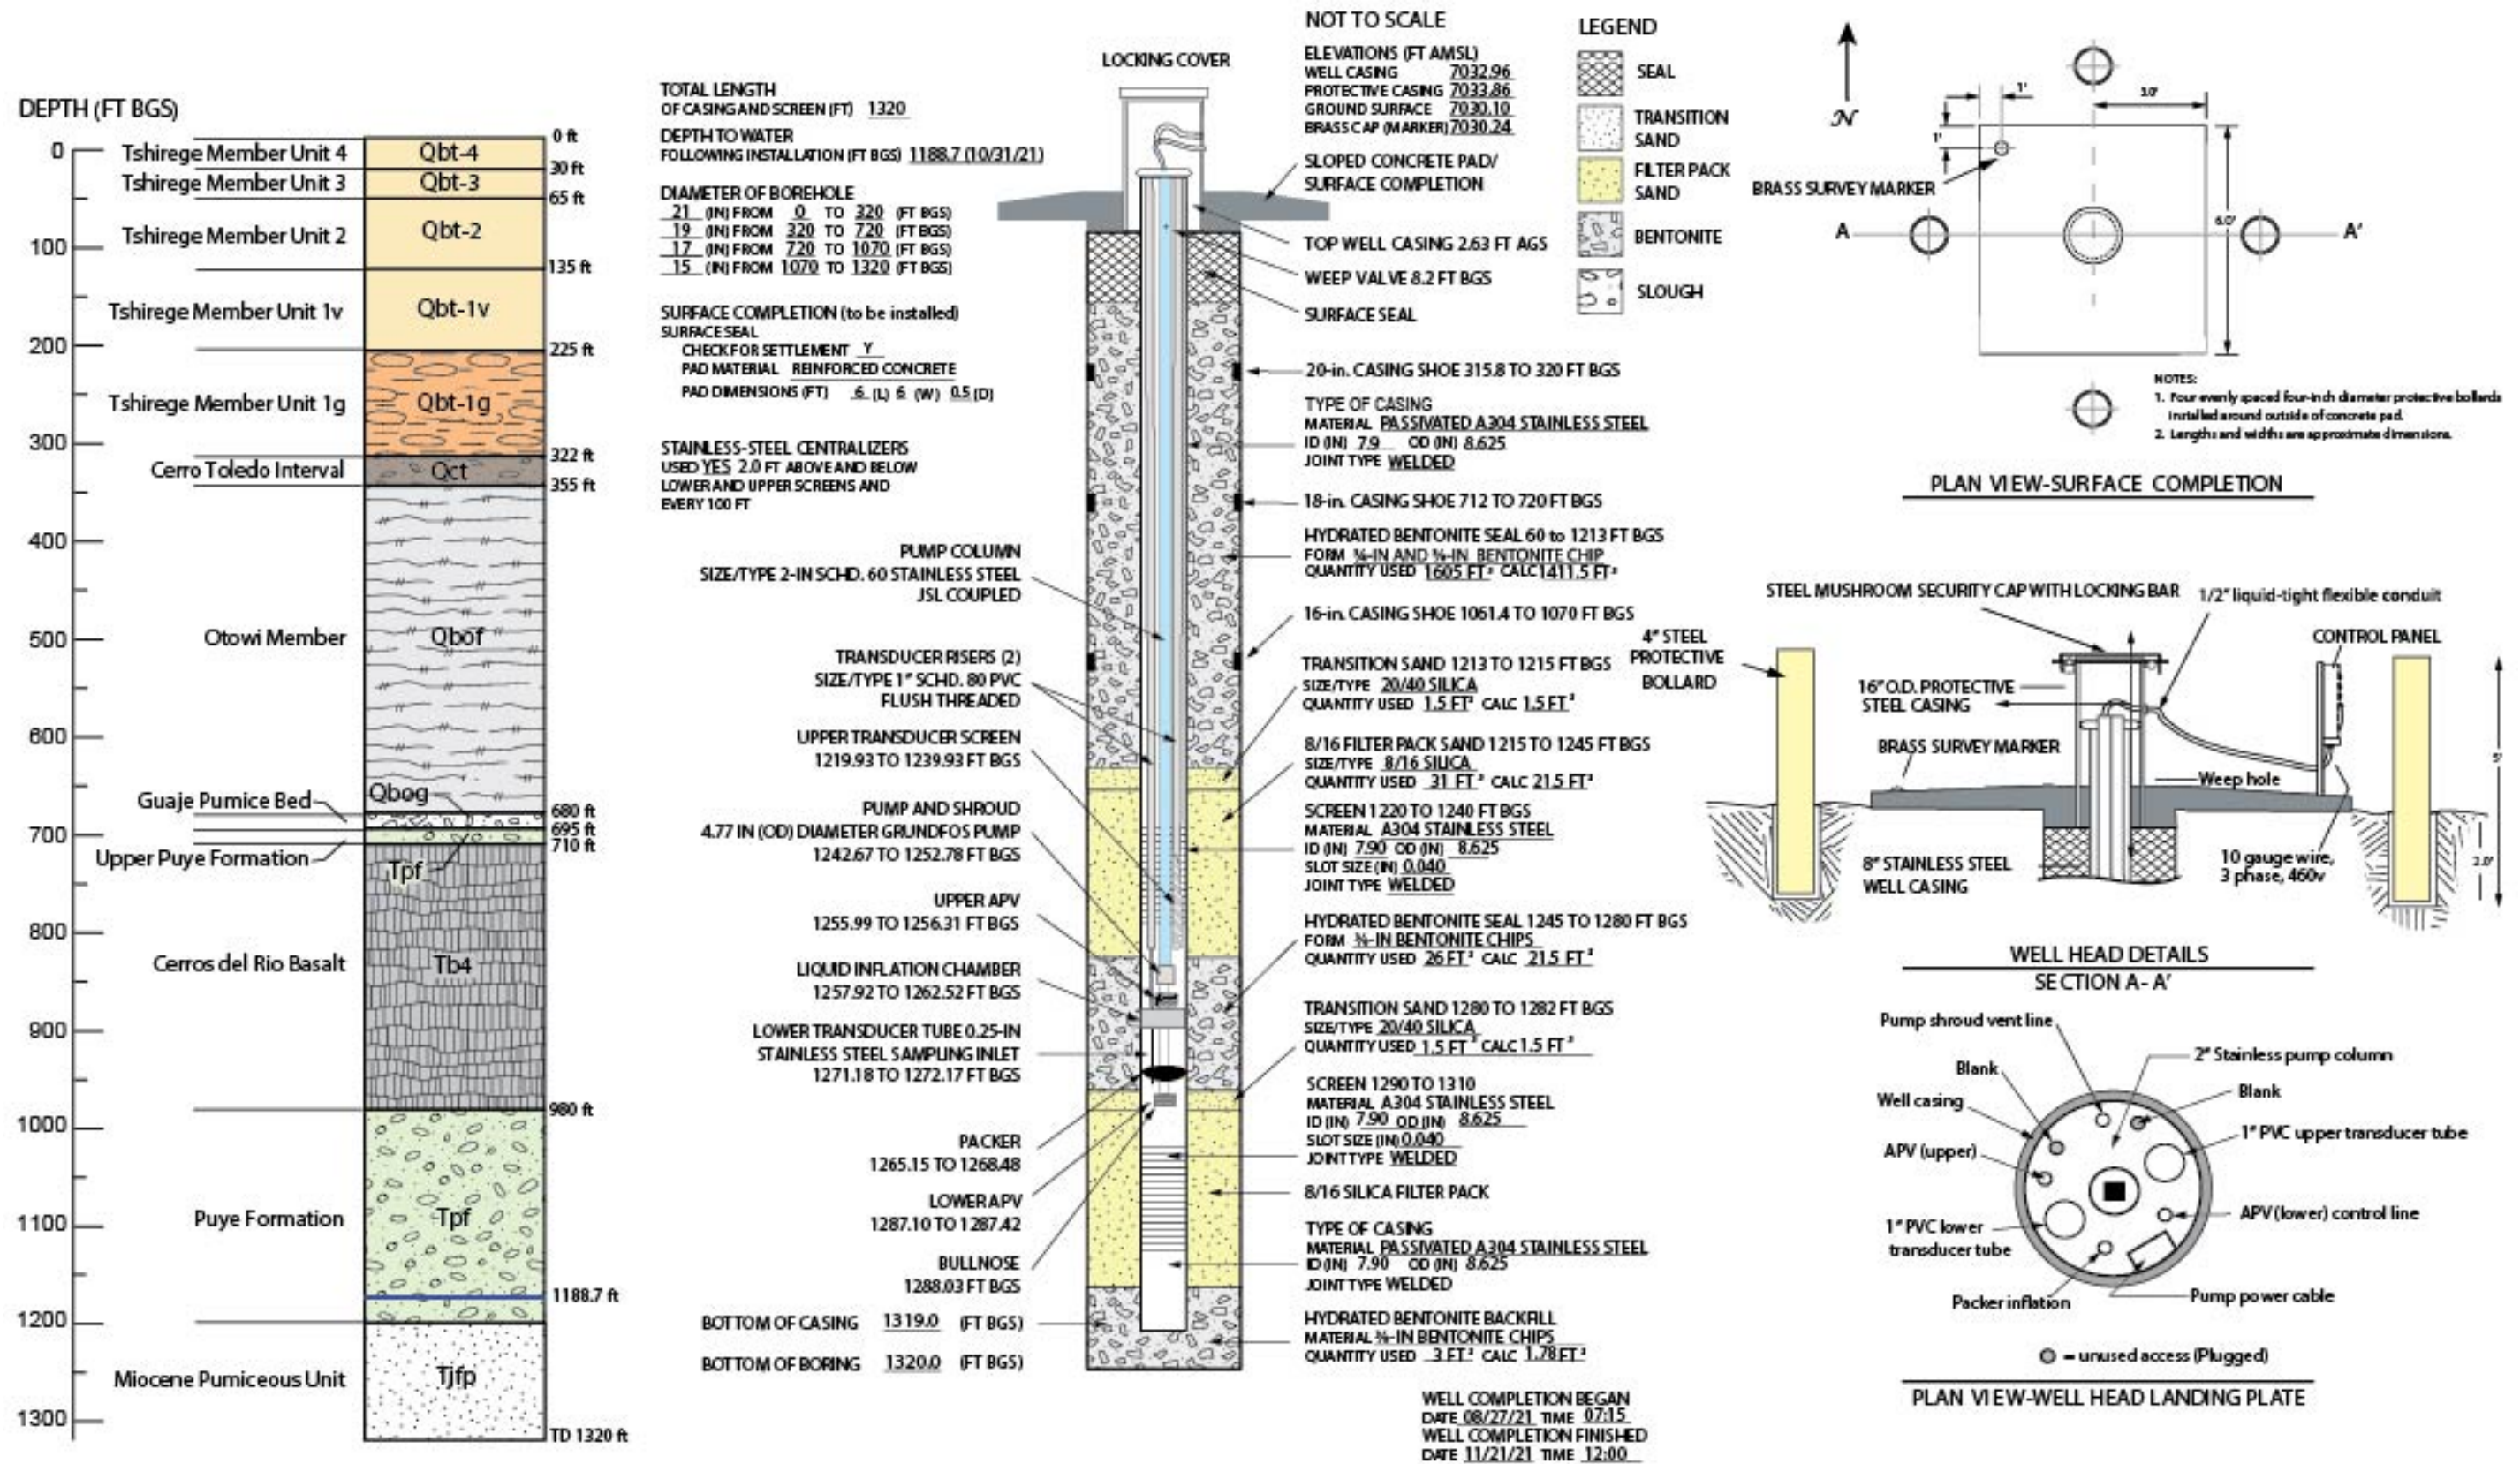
Monitoring well R-72 as-built construction diagram and technical well completion details
